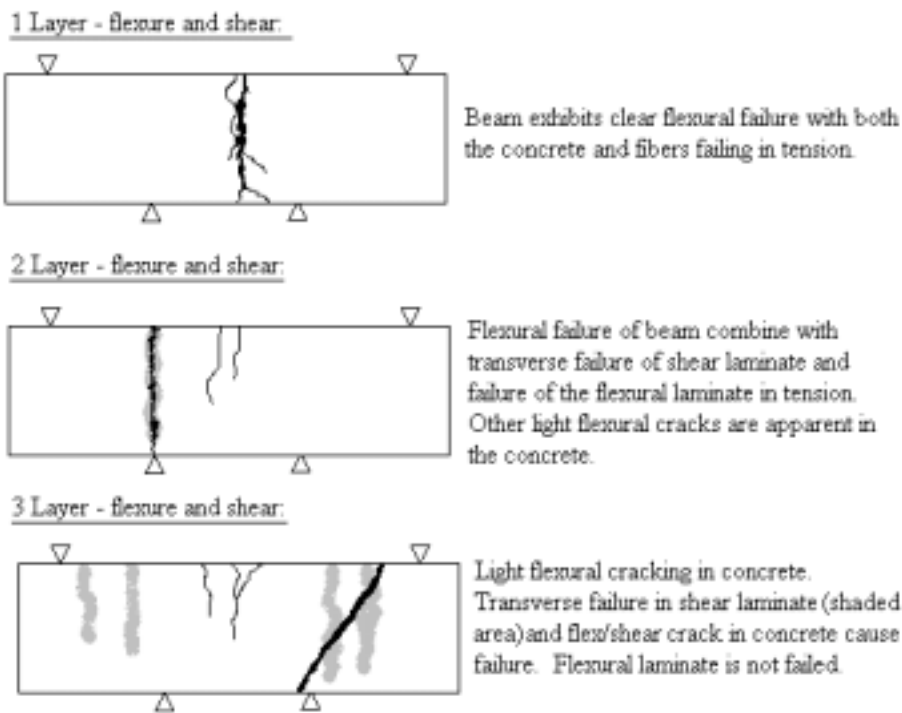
Typical cracking and failure modes for beams strengthened with the MBrace™ glass system for shear and flexure.
